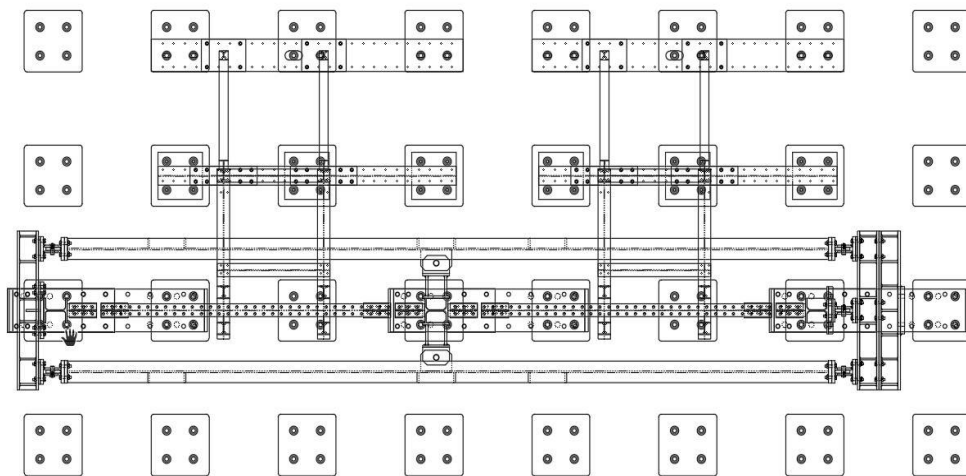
Experimental test set-up for test on DRD3 frame – Plan view
